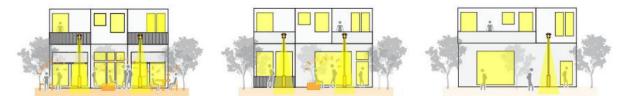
Illustration of lighting from buildings and street lights on pedestrian streets
